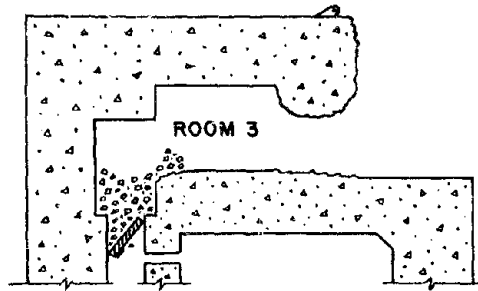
Station 1341, Able Island, Front Wall-Third Floor, Vertical Section, 7500 ft from GZ
